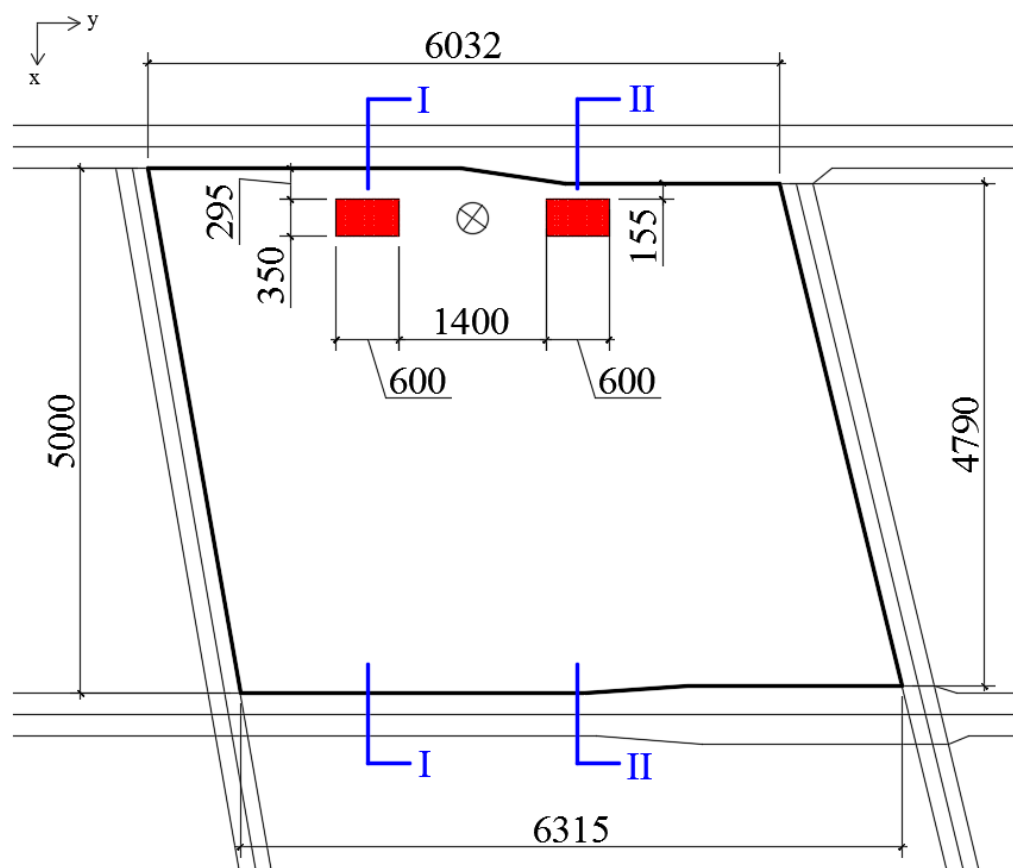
Bridge deck slab including loading points and location of cross sections (blue marked); all dimensions are in mm.
